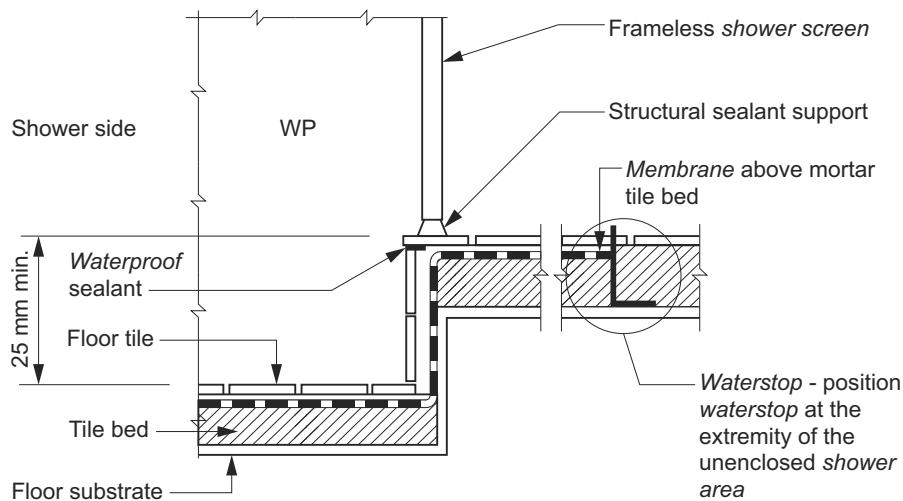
Typical unenclosed stepped down shower construction (membrane above tile bed)
